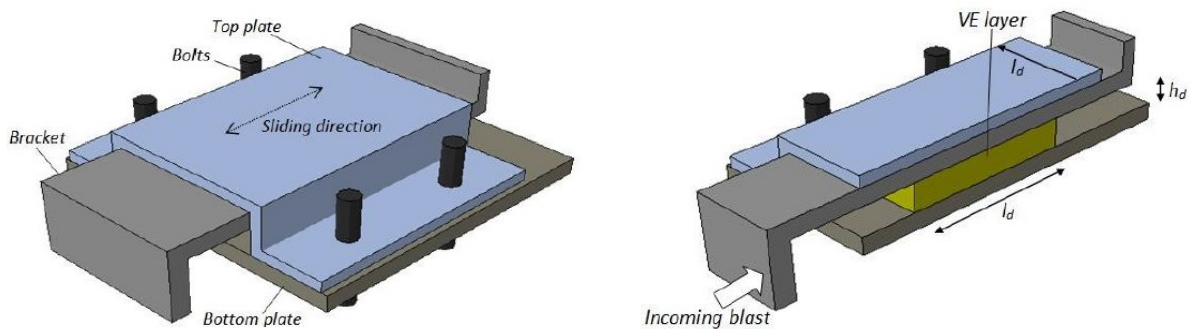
26 : VE device assembly (left) and cross section (right)
